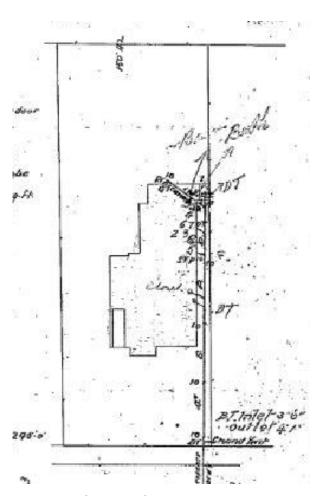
The footprint of the house in 1907, as shown on the MMBW Property Sewerage Plan (PSP).
